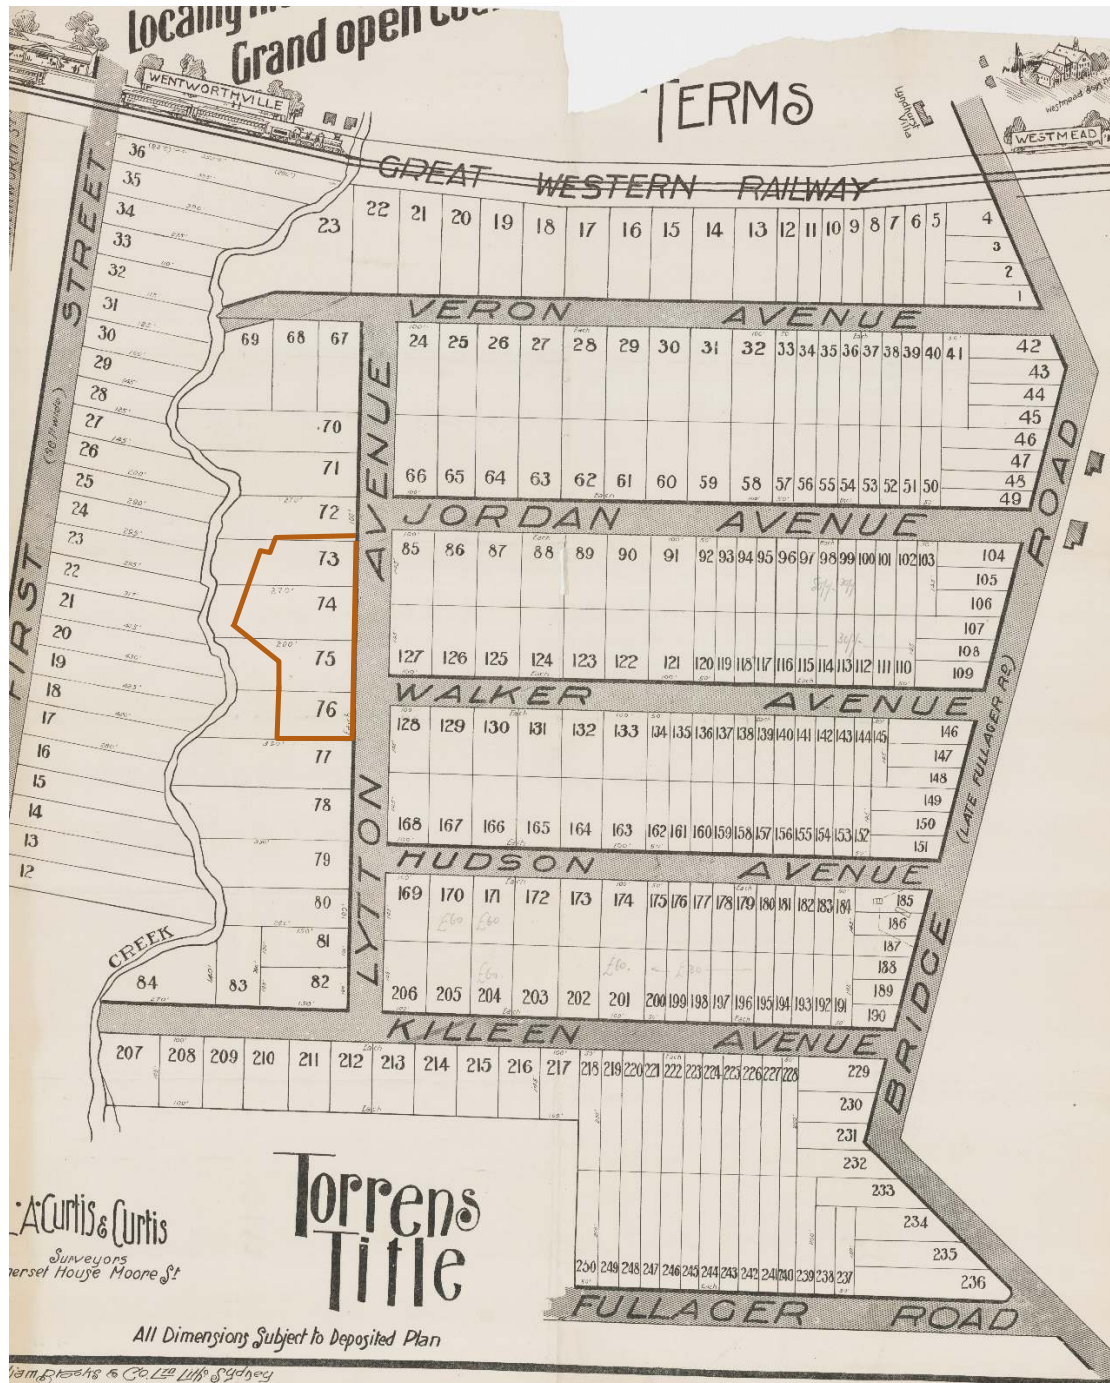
Undated subdivision plan for the Hillcrest Estate. First Street shown to the left, divided from Lyttton Avenue by the Finlaysons Creek. (Source: SLNSW¹⁶)
